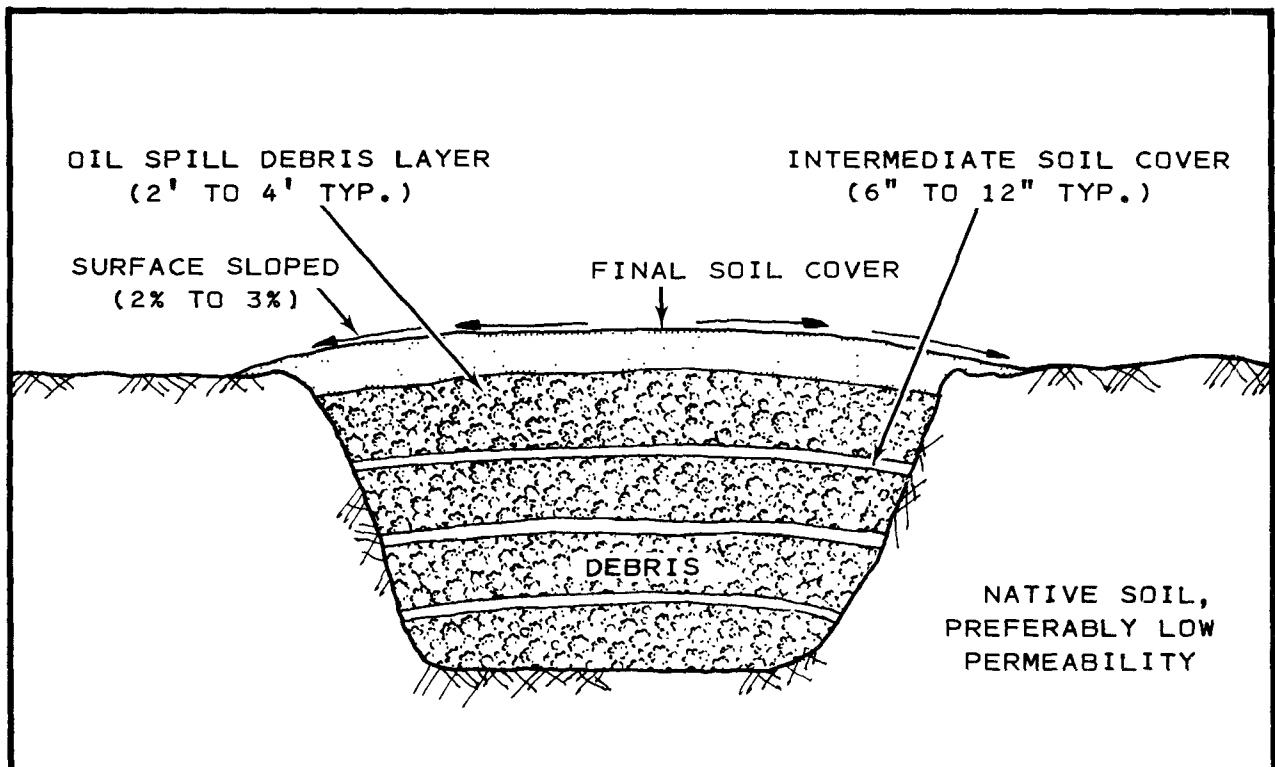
TYPICAL CROSS-SECTION OF A BELOW-GRADE DEBRIS DISPOSAL SITE.
